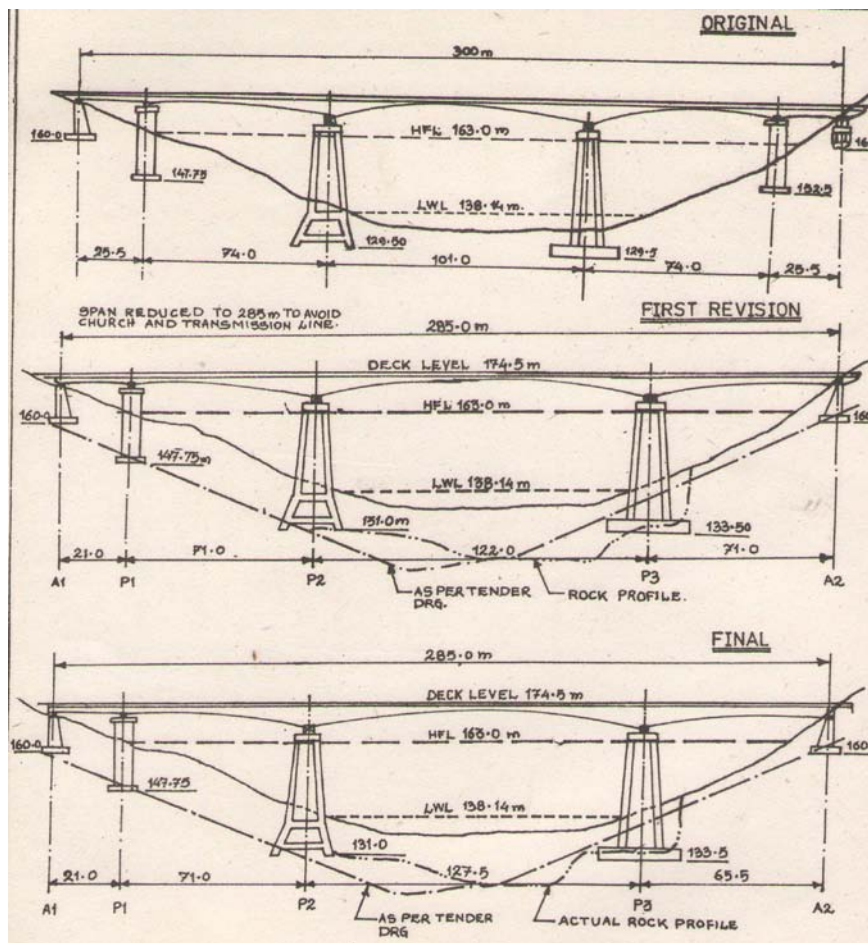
Kaladan Bridge On Road Lungleh-Tuipang
